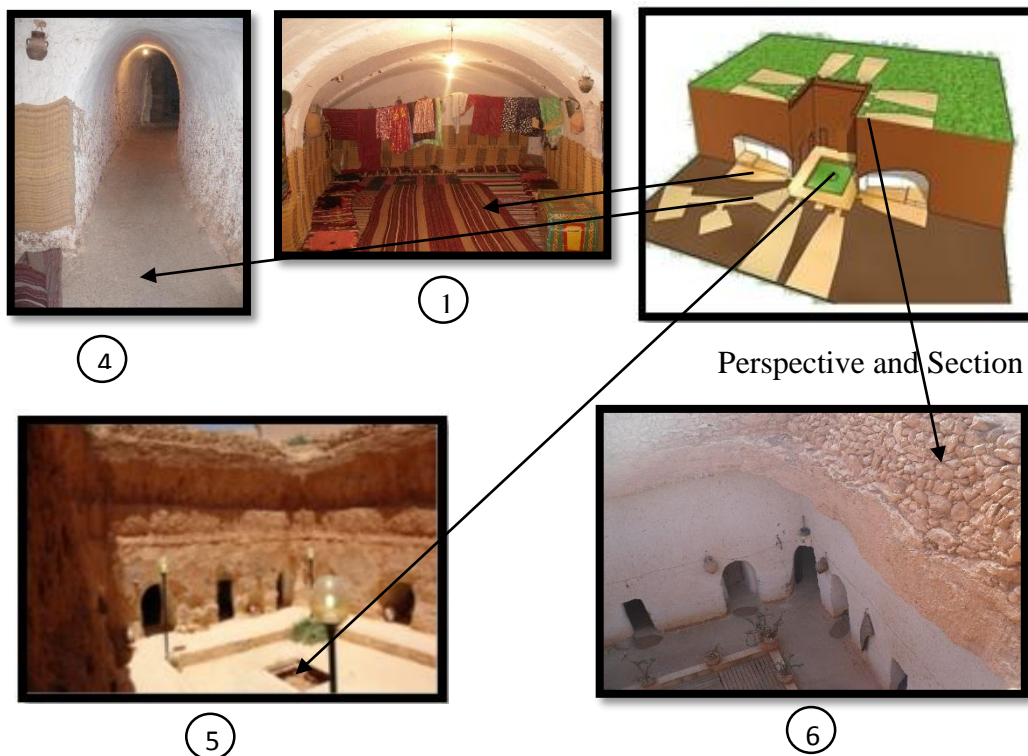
Perspective, section and photos for some design details (photo by author)
